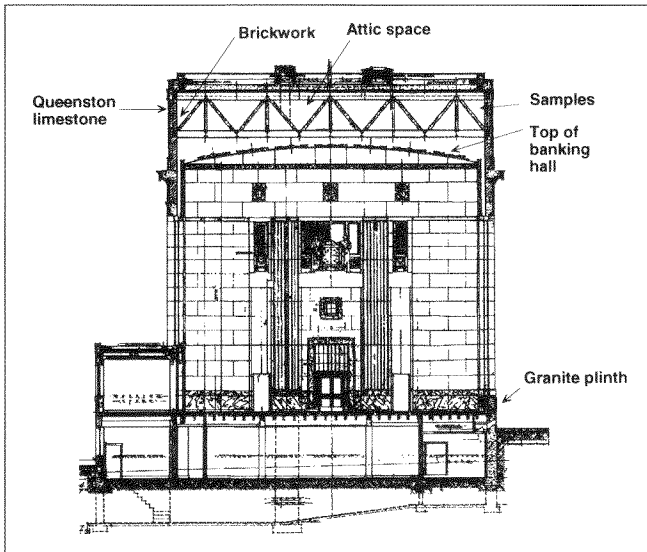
Transverse section through banking hall and west annex, looking north. Original drawing. Source: Canadian Centre for Architecture (CCA), Montreal.
